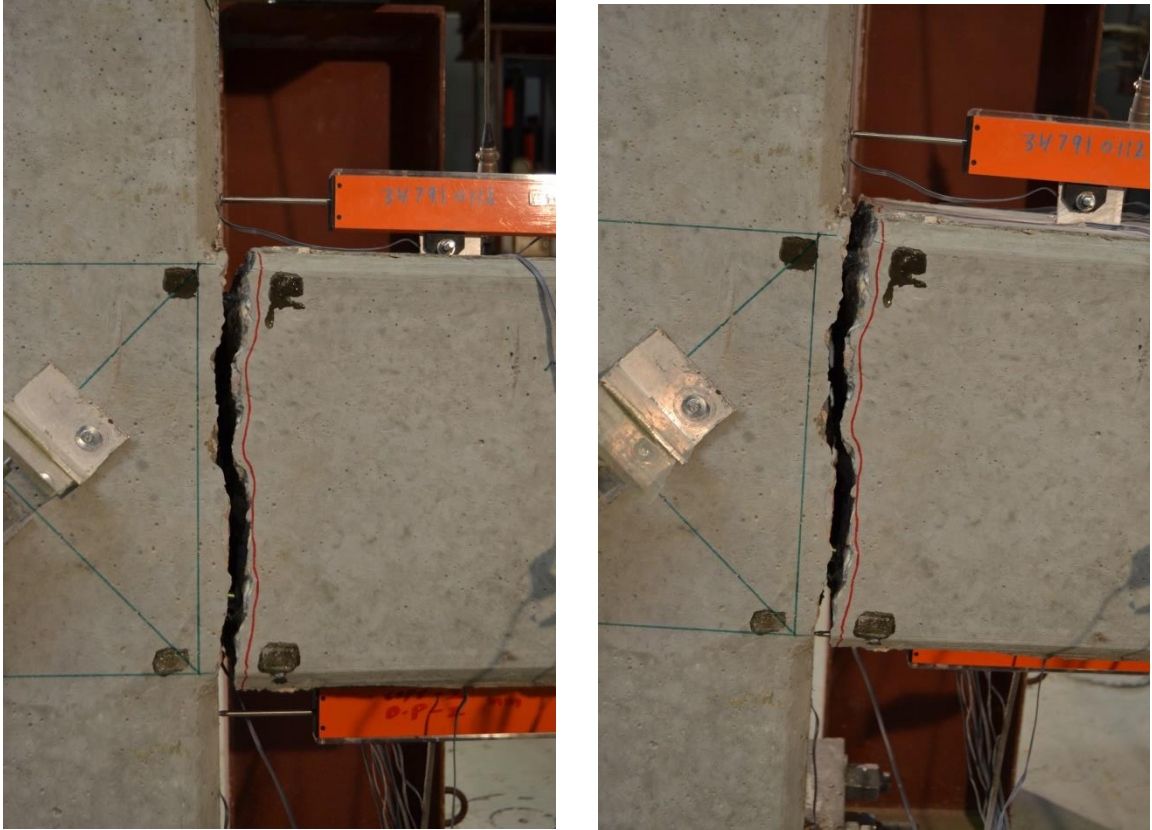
33: Opening of the cracks with applied load and after removing the load
